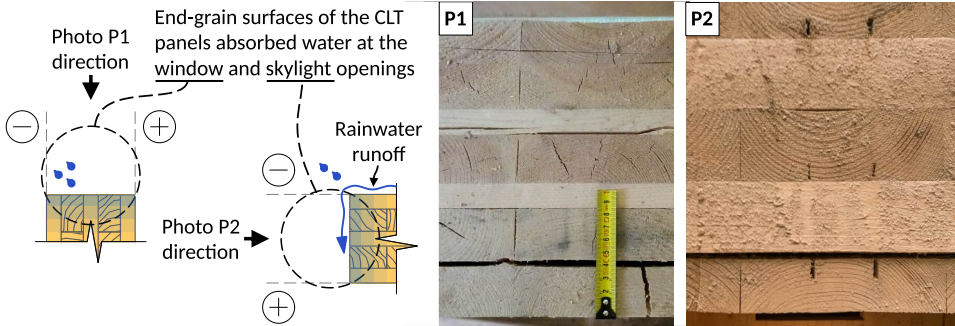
Wall to window and roof to skylight connections, which experienced repeated wetting and where cracks and delamination occurred (P1, P2) after moisture dry-out (P1 = building A, P2 = building B).
